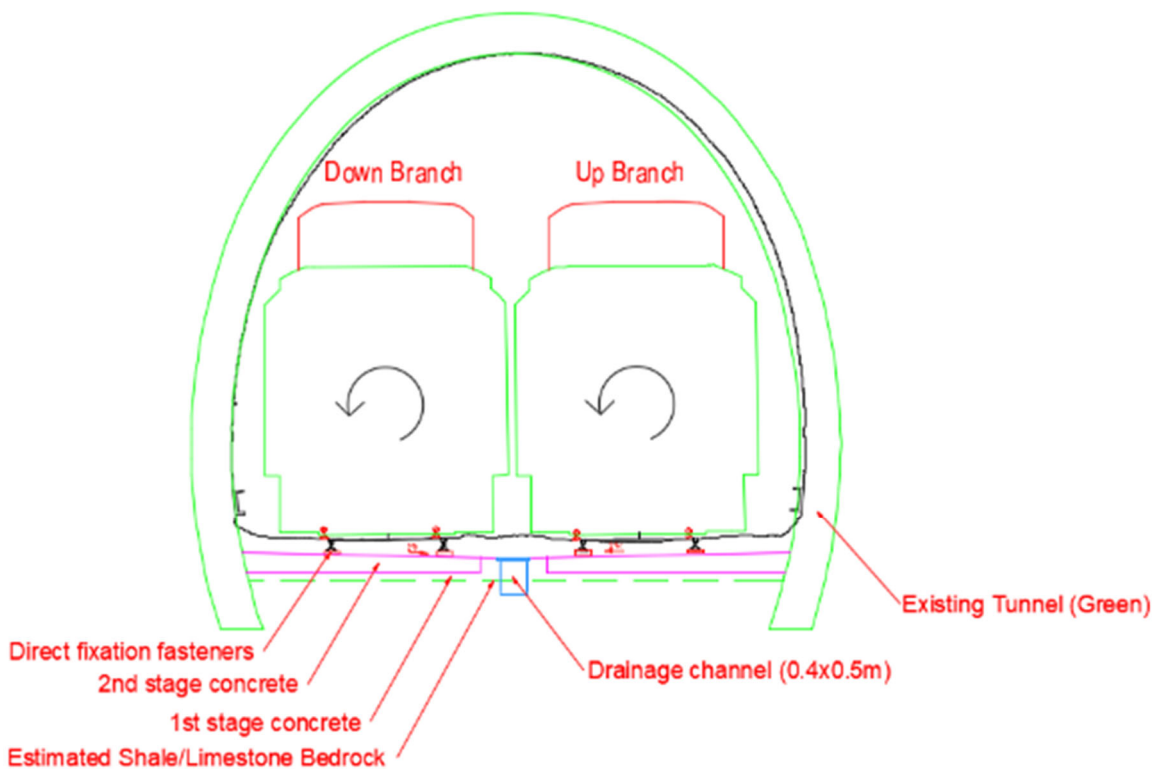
Proposed Cross Drainage System at Phoenix Park Tunnel
